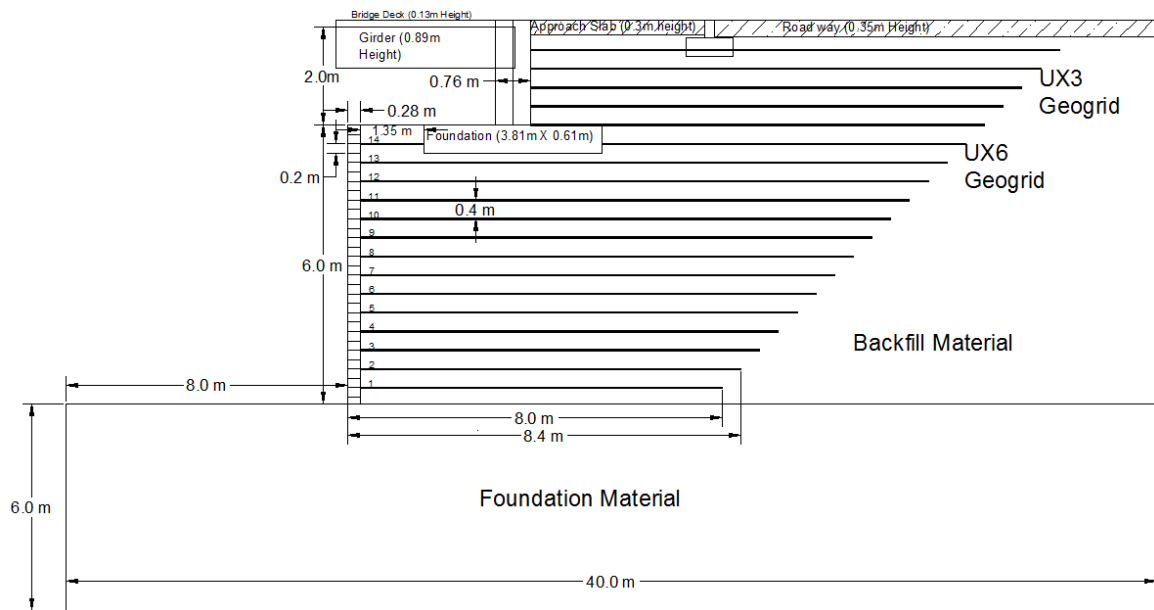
Cross-section of the Founders Bridge (Abu-Hejleh et al. 2002)
